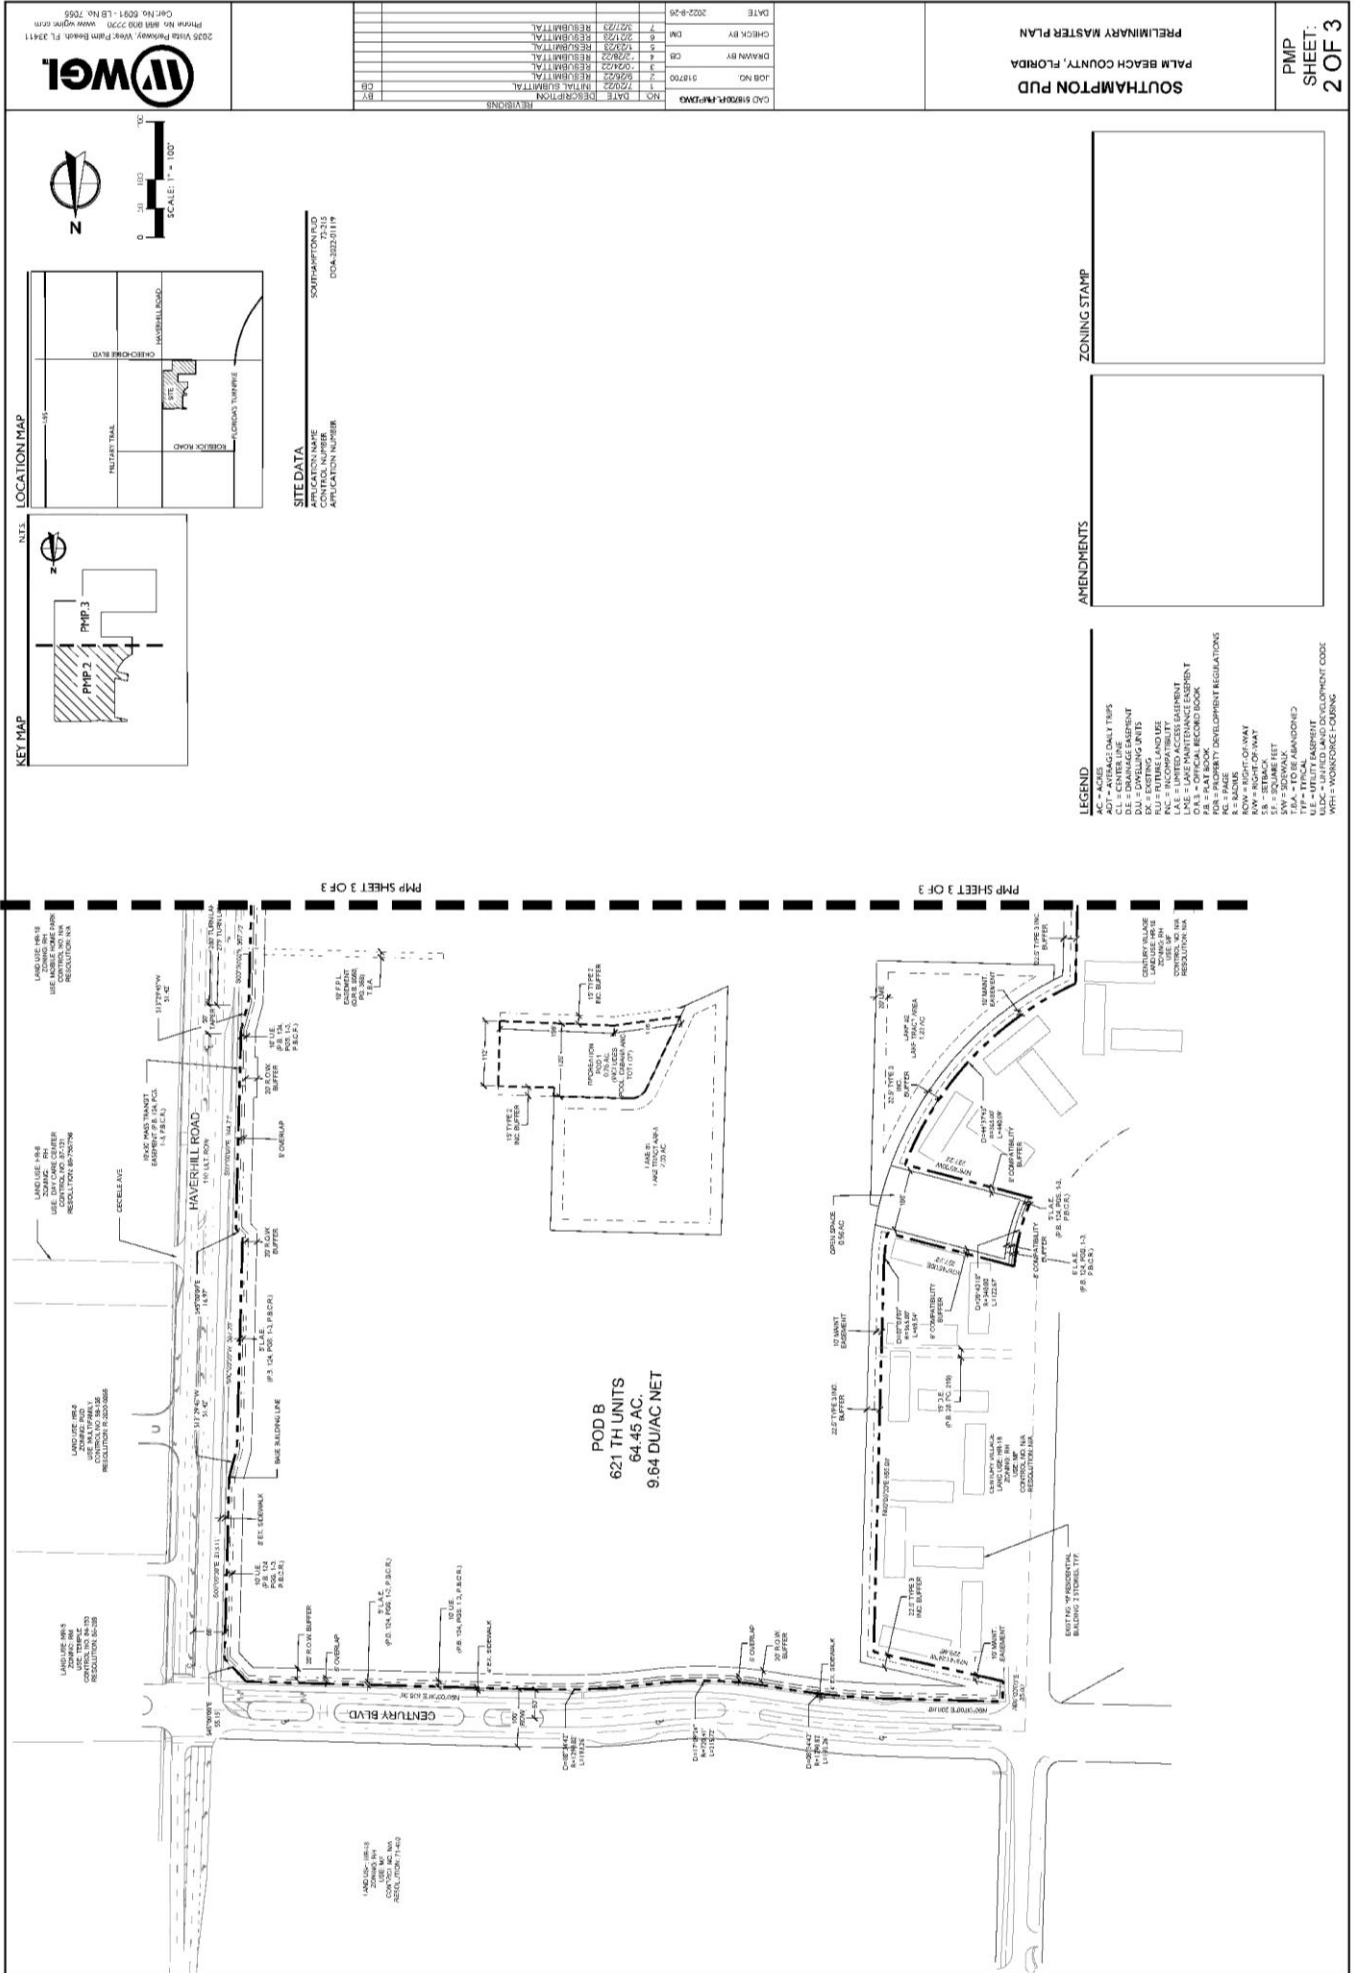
Preliminary Street Layout Plan dated February 21, 2023
